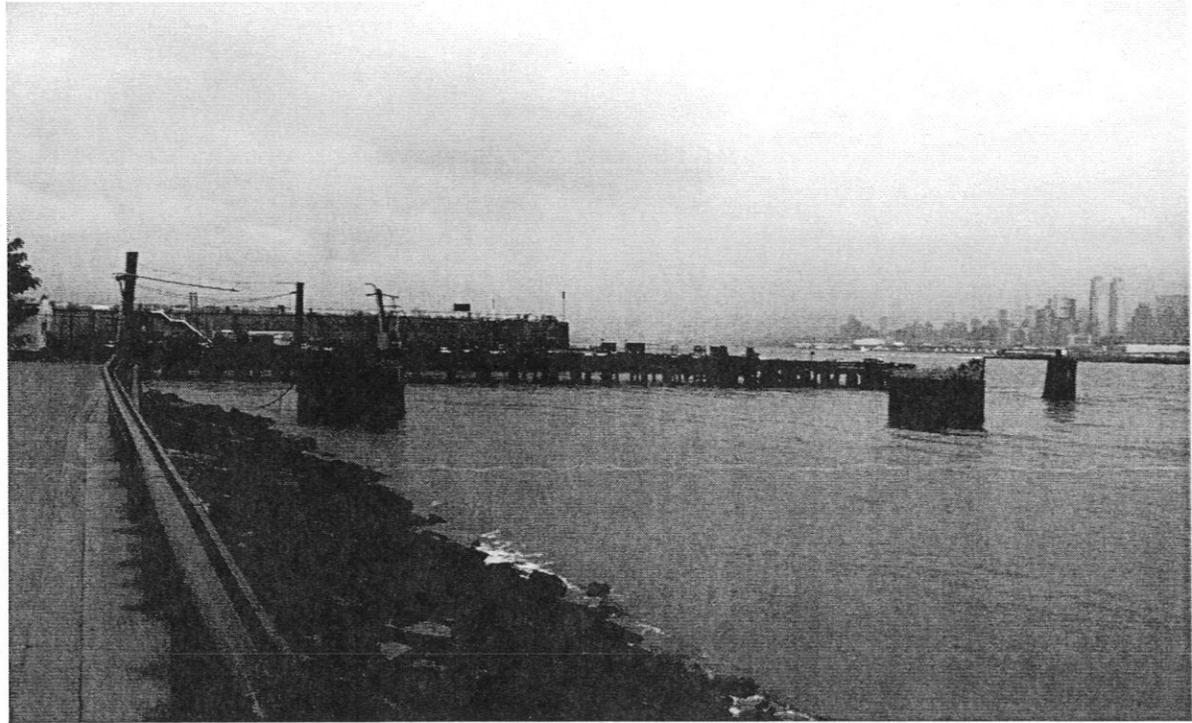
View to southeast at north side of north-most pier at Union Drydock
